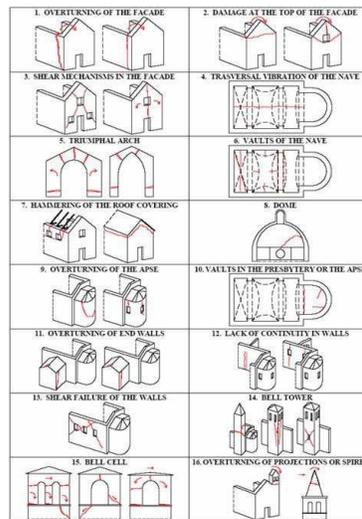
Behaviour of a masonry Romanesque church. Masonry rigid block [5.10]
